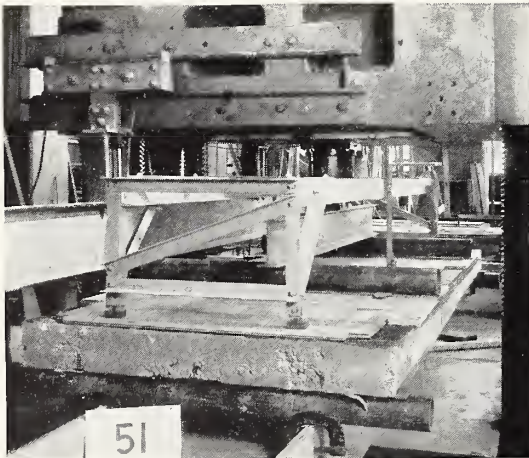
Floor specimen AW-T1 under transverse load.
